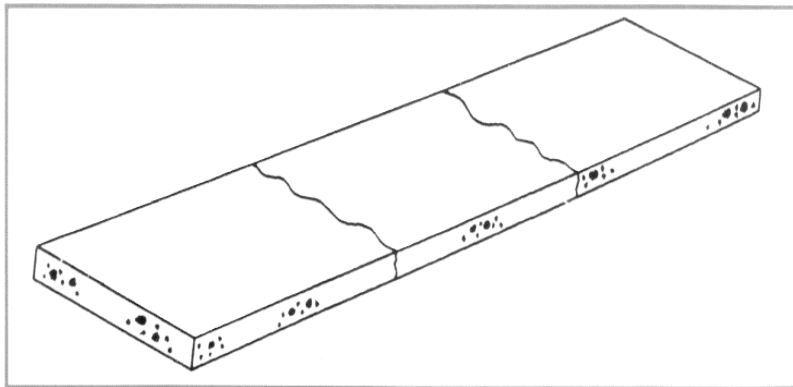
Initial cracking in concrete pavement without contraction joints (1).
